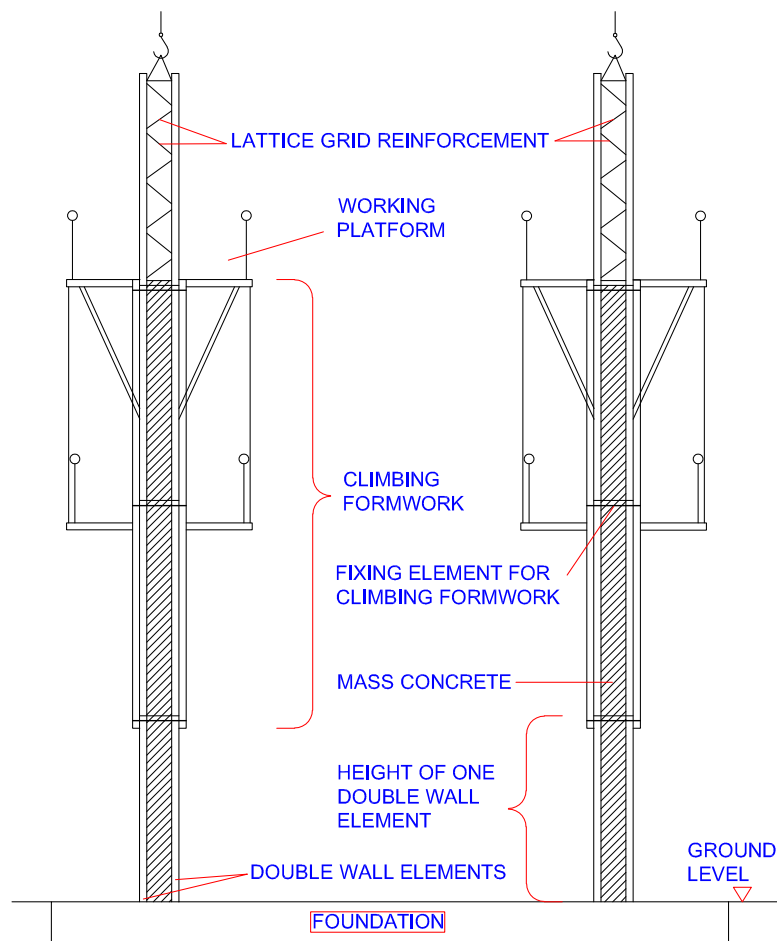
Proposal of climbing formwork used in Patent [34]
